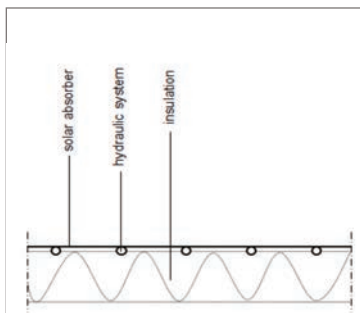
Example of roof-mounted unglazed flat-plate ST collector; Figure 1.7 - Typical cross section with indication of main components (Munari Probst & Roecker, 2012)
